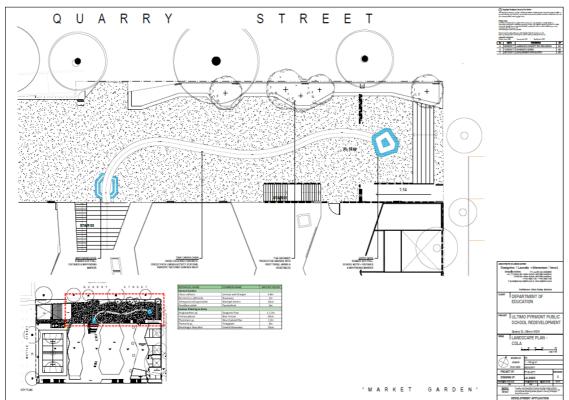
Landscape Plan - Market Garden (DesignInc)
